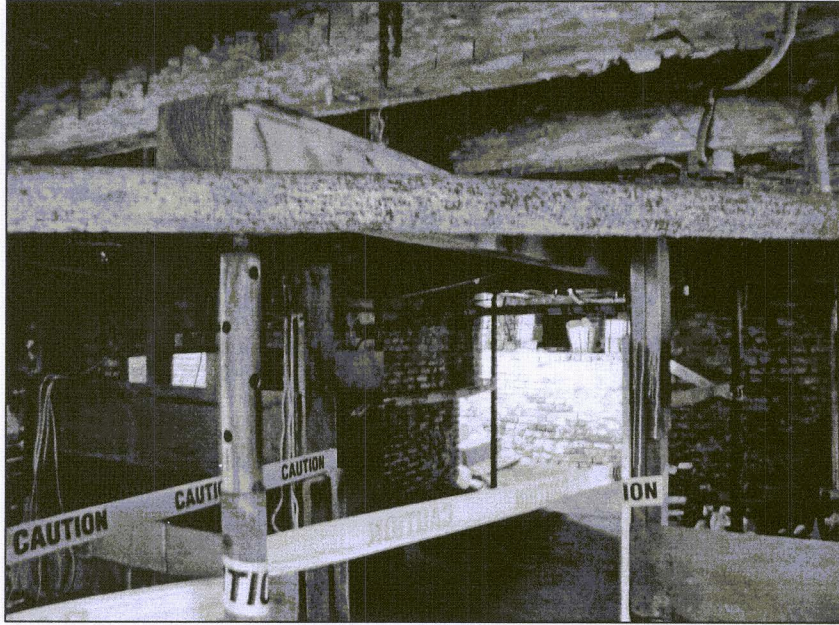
Basement. Notice the hand-hewn ax marks on the floor joists, as well as the numerous secondary support posts.
